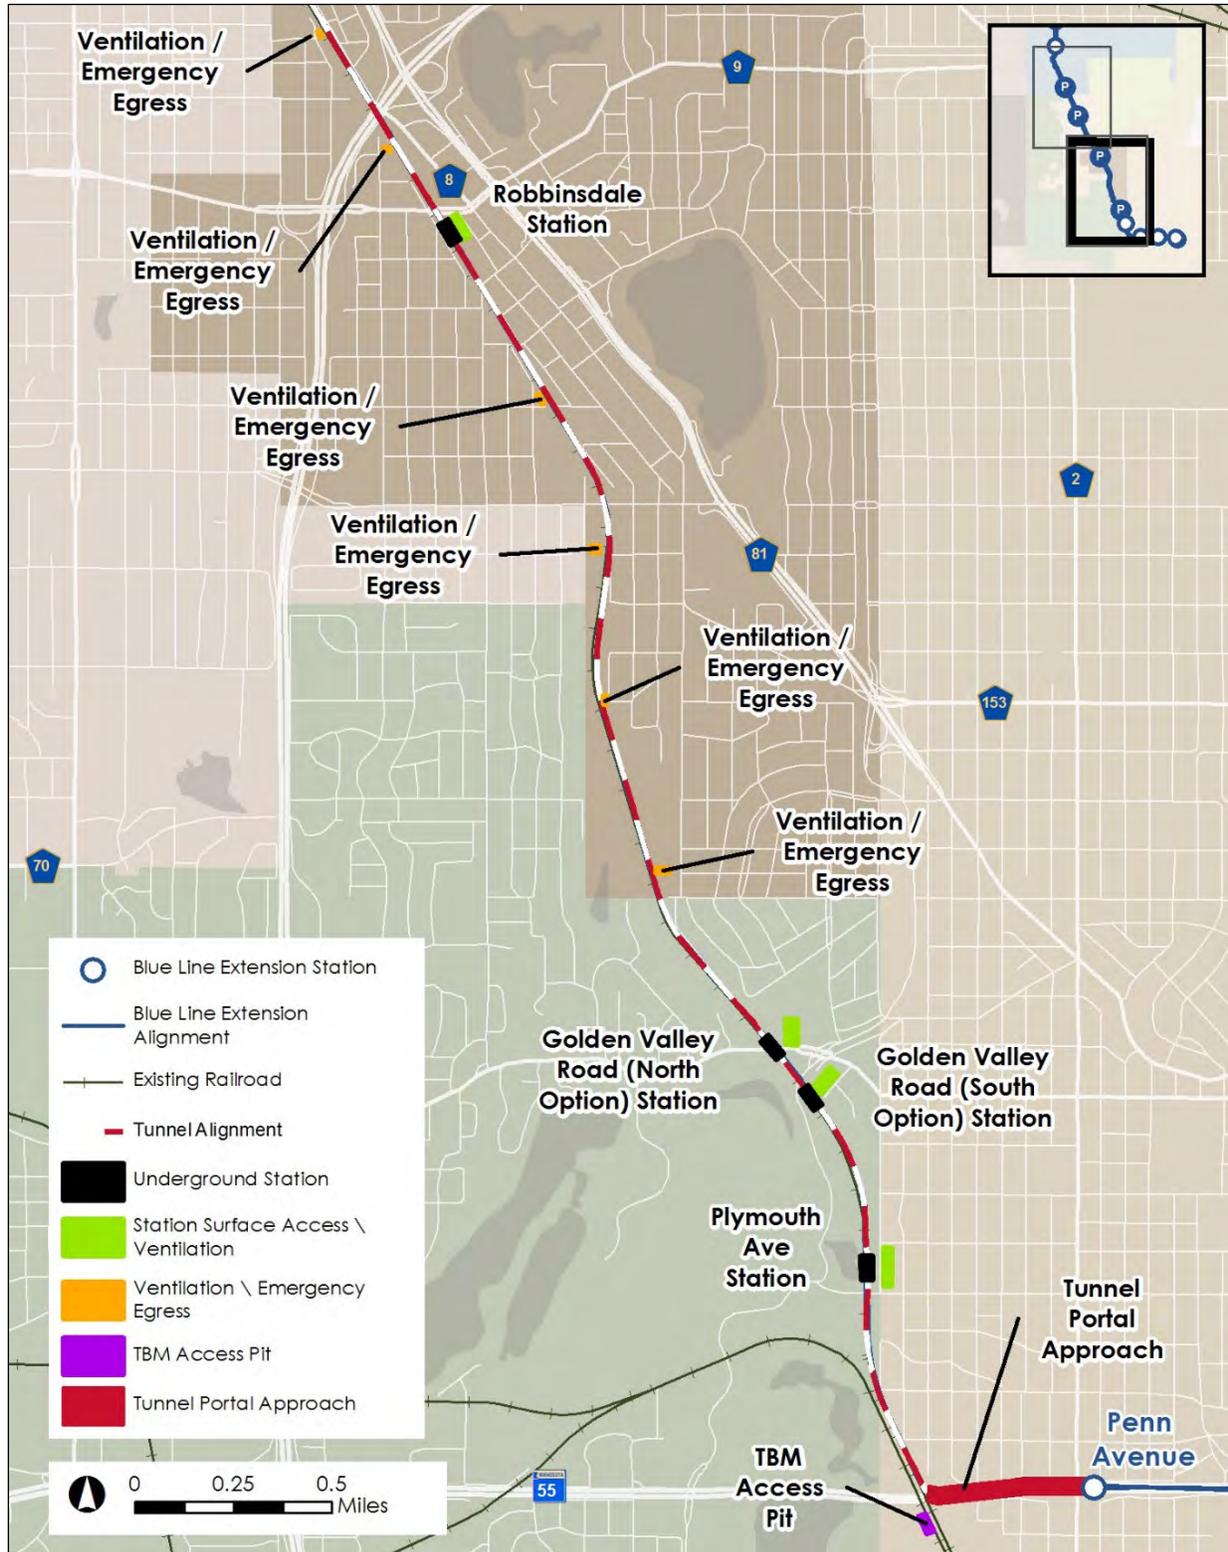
Deep Tunnel Conceptual Plan View – North
